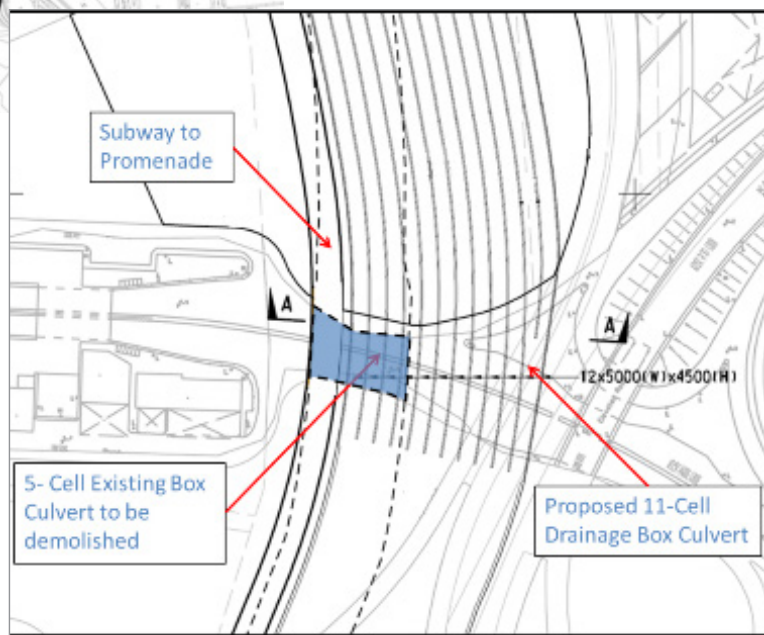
Overview of the construction area for Reconstruction of Existing Decked Nullah at Approaching Ramp to Kai Tak Tunnel
